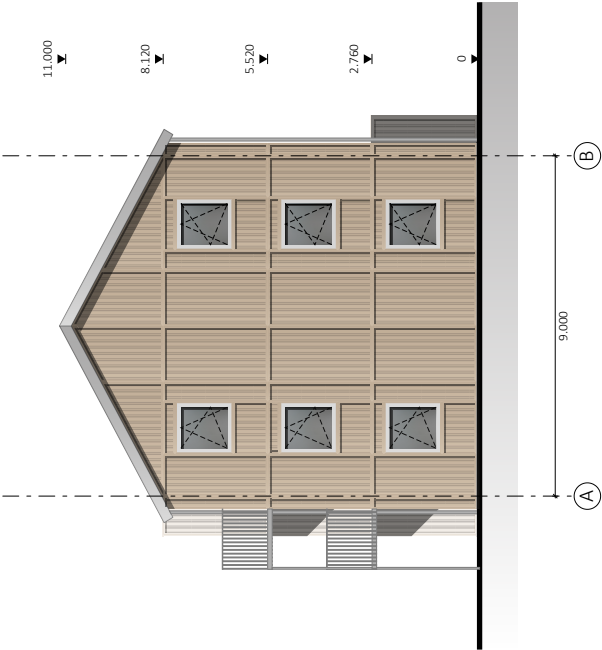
Elevation / 1:200 / West (own illustration)
